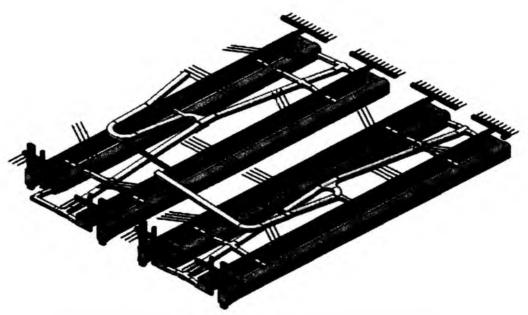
A typical cavern layout along with superimposed water curtain system.
